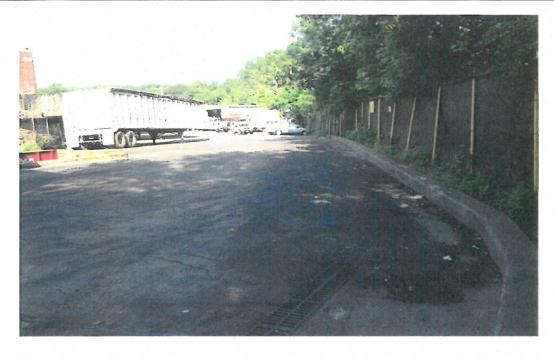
Transfer Station curtain drain at the north end of Fayette Avenue - facing west
